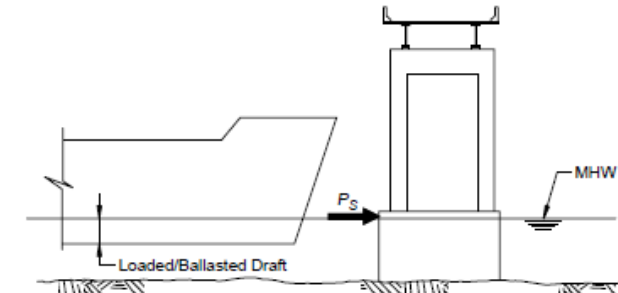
Ship Impact Concentrated Force on Pier (for Foundation Design and Overall Stability)
